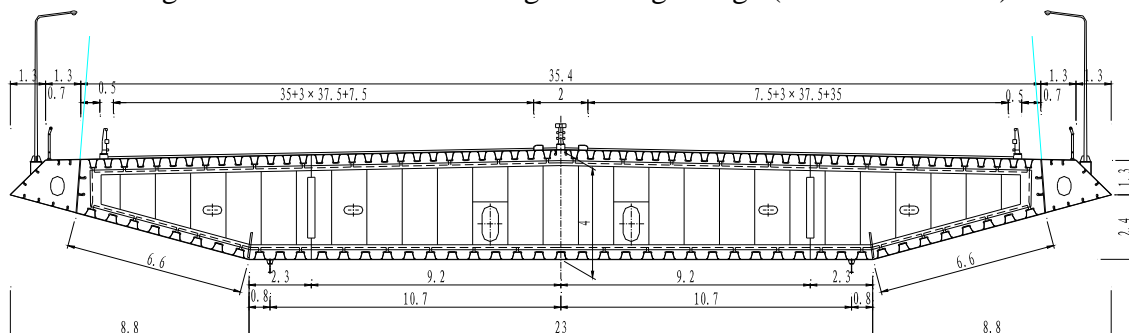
Deck cross-section of the Jiangsu Sutong Bridge (Dimensions in m)
